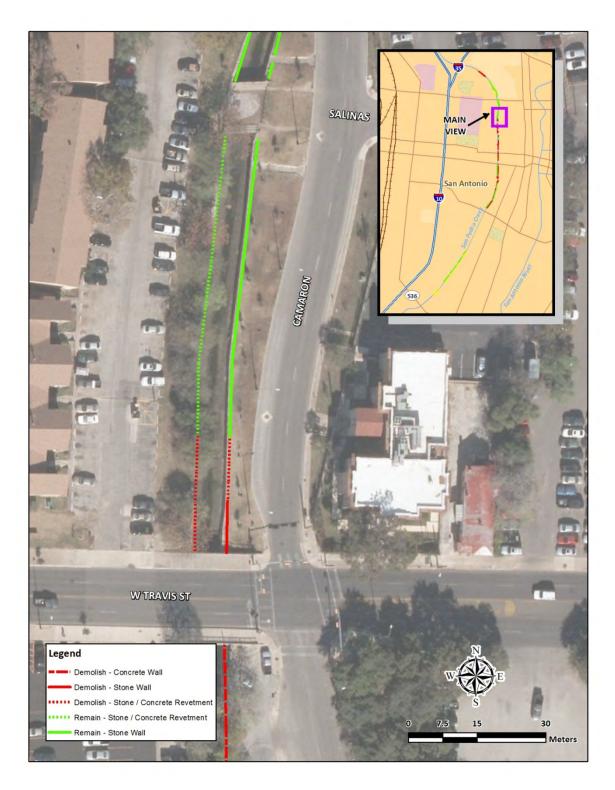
Proposed impacts to the west and east bank retaining walls between Salinas Street and W. Travis Street.
